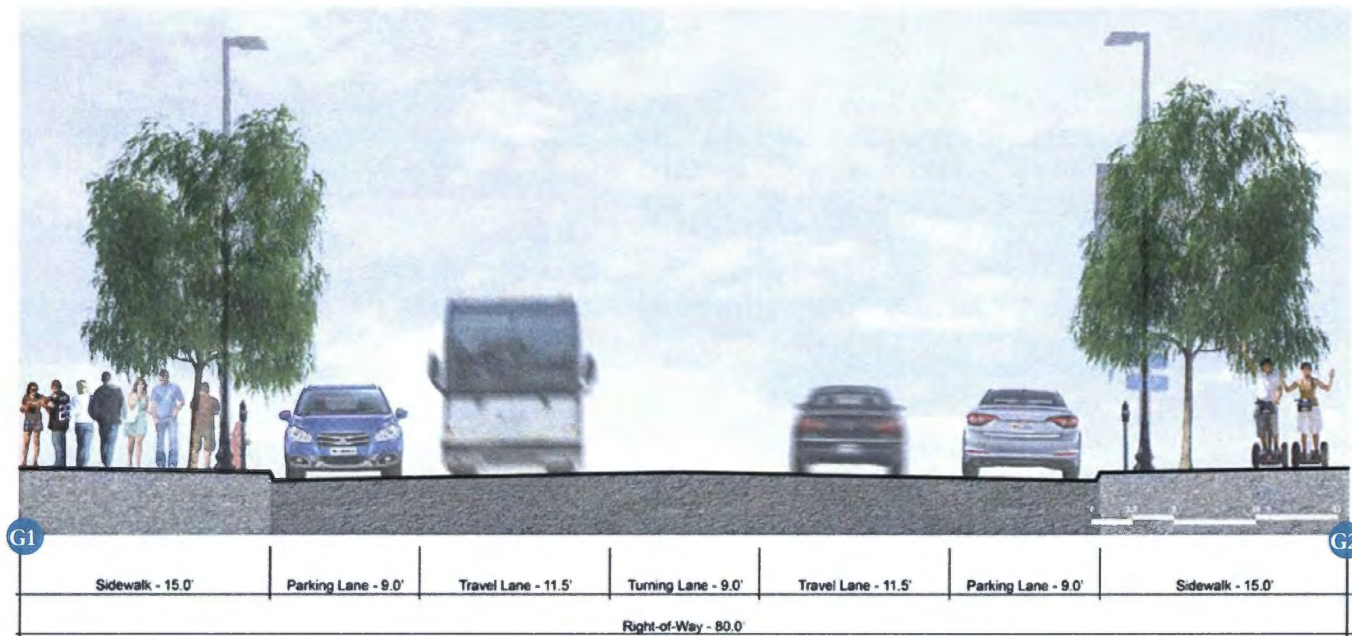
Prospect Avenue between East 8th St and Huron Rd Existing Section
